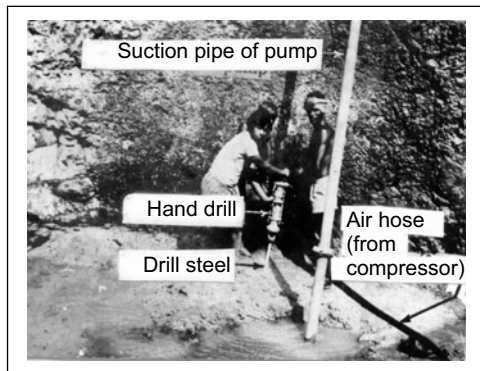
Drilling of shot hole at the bottom of a hard rock well with a hand drill equipped with integral steel rod. Note the suction pipe of the pump used to lower the water table during drilling
